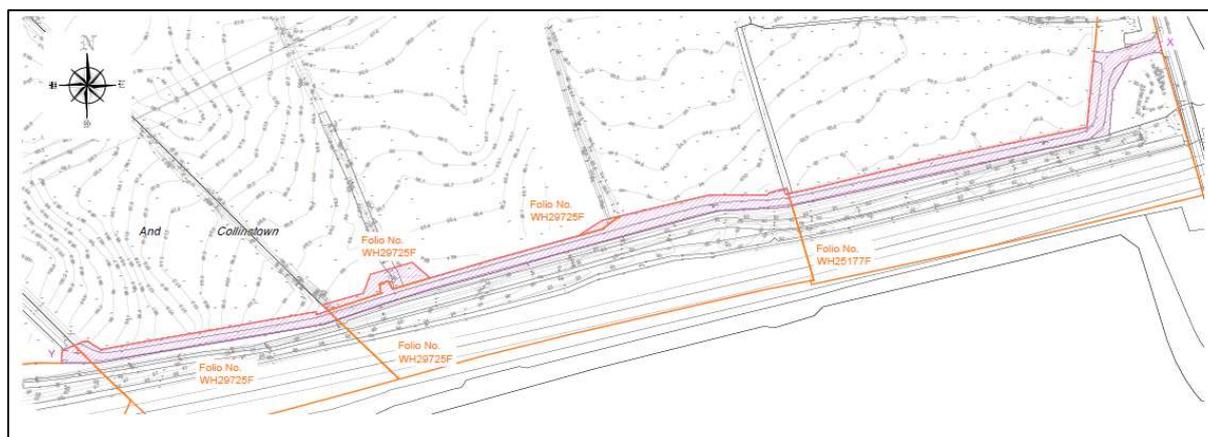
Site Location showing Proposed Development Lands (purple boundary)
